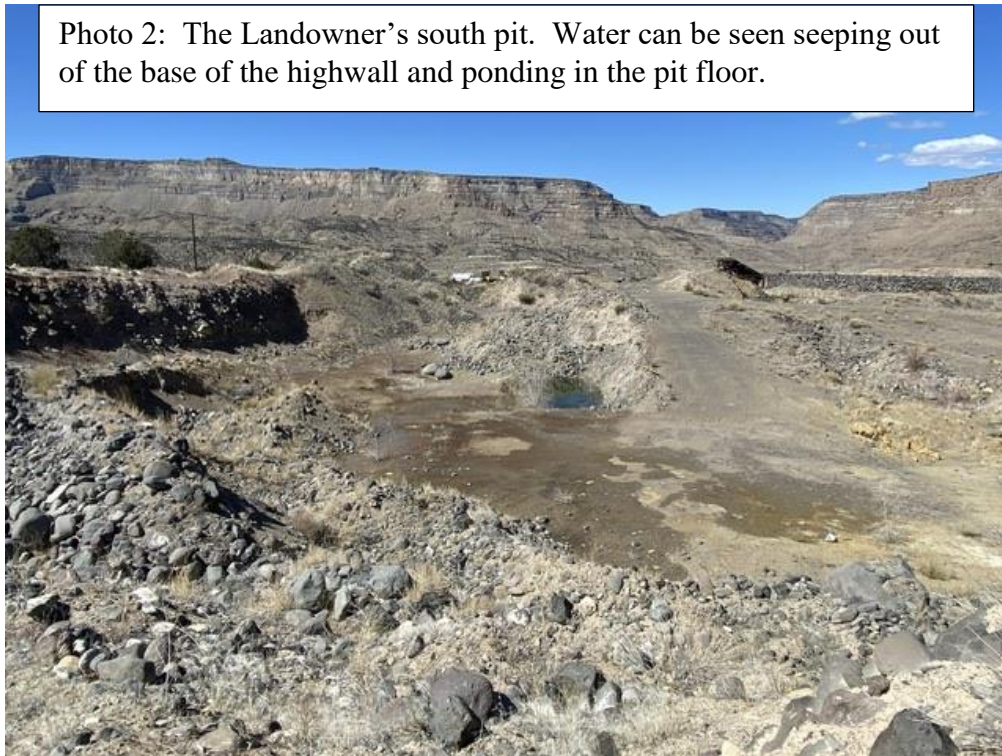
The Landowner's south pit. Water can be seen seeping out of the base of the highwall and ponding in the pit floor.
